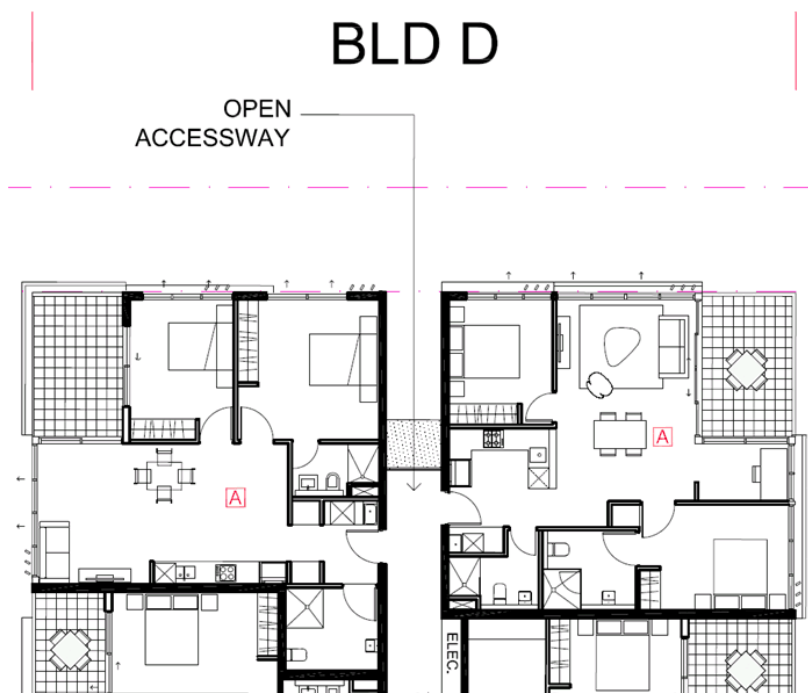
Future indicative floor plan of the affected units based on the layouts of the corresponding units on Level 4 and above
